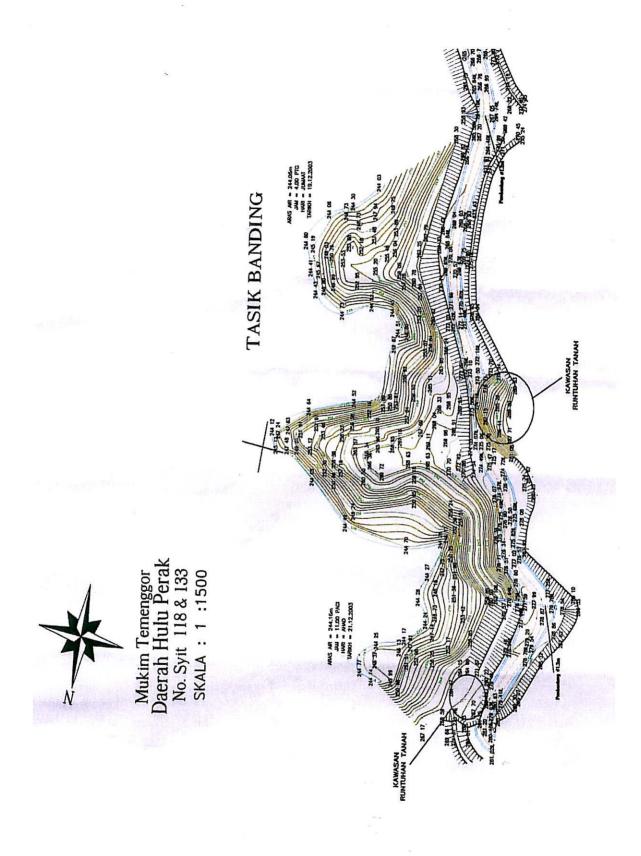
Failure scar captured in the Survey Plan before building construction.
